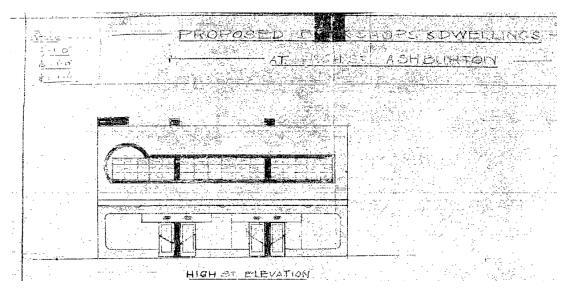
Extract of original architectural drawing, 174-178 High Street, Ashburton showing High Street Elevation. Designed by G. James 1950. (Source: City of Camberwell building permit plans)
